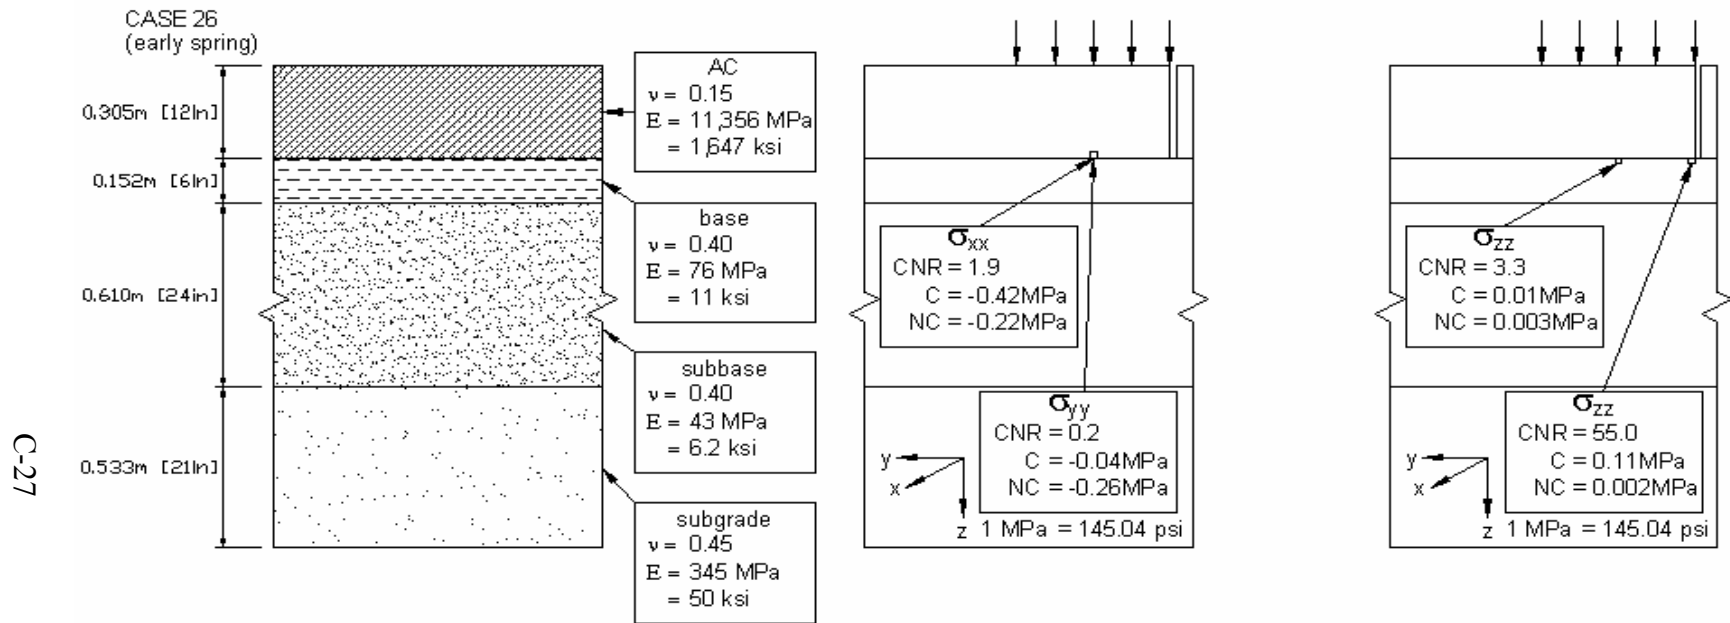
Summary cross section for case 26, (C – stress in cracked pavement, NC – stress in pavement with no crack, CNR – crack/no crack (stress) ratio)
